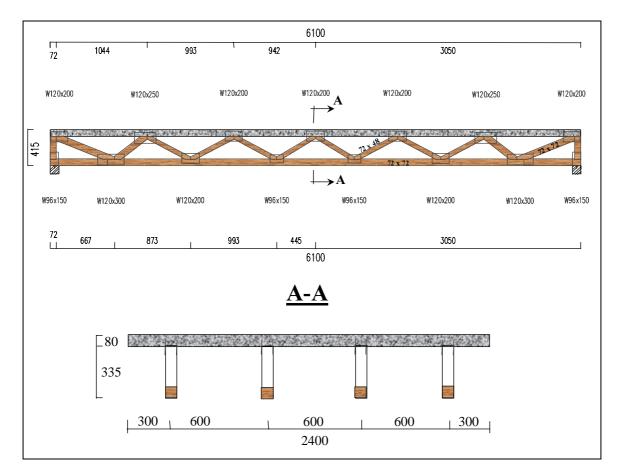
Basic structure of the element wood-concrete composite floor - This floor was tested in [1], [3].
